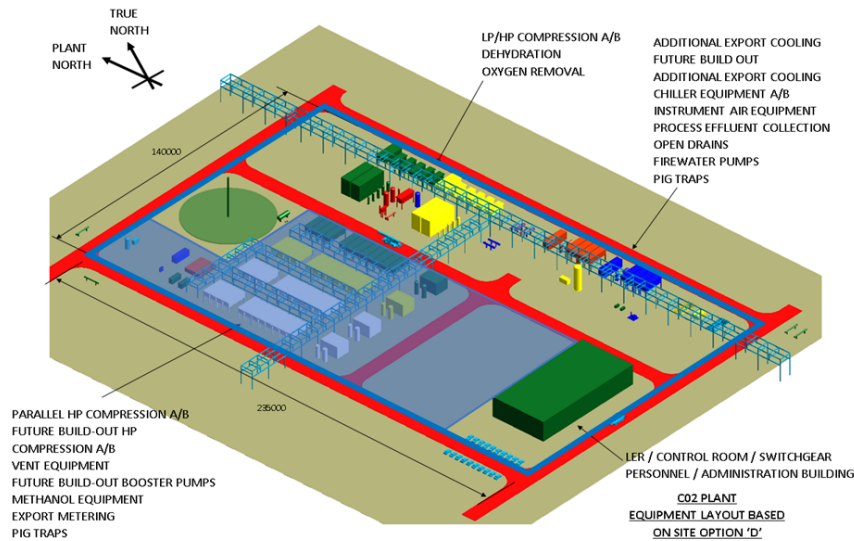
Acorn PCI Sapling compression and conditioning proposed layout (build-out only facilities shaded out) (Genesis, 2019)
